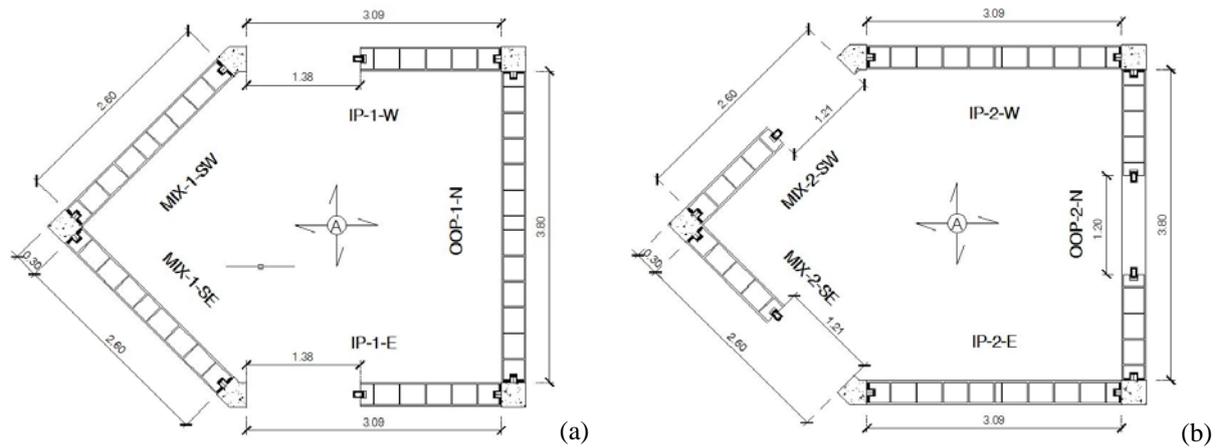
Infills distribution at storey 1 (a) and storey 2 (b) of the model building (dimensions in m).
